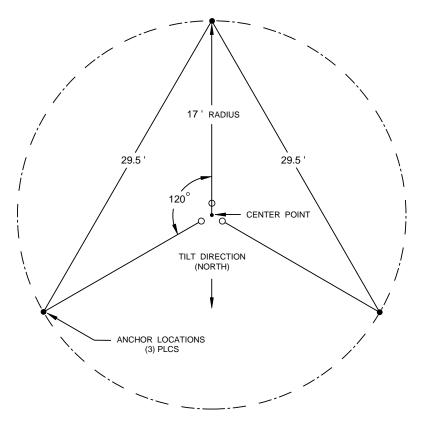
Top View of Base and Guy Anchor Layout
